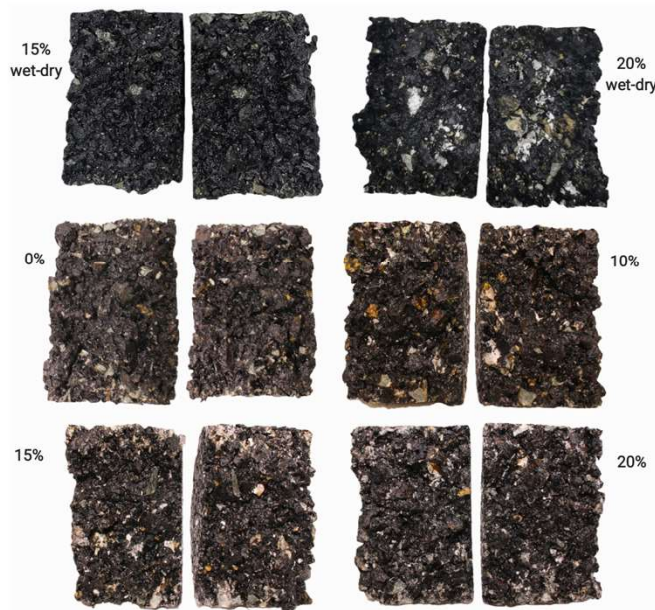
Photos of ITS fracture surfaces for salt conditioned gabbro samples
